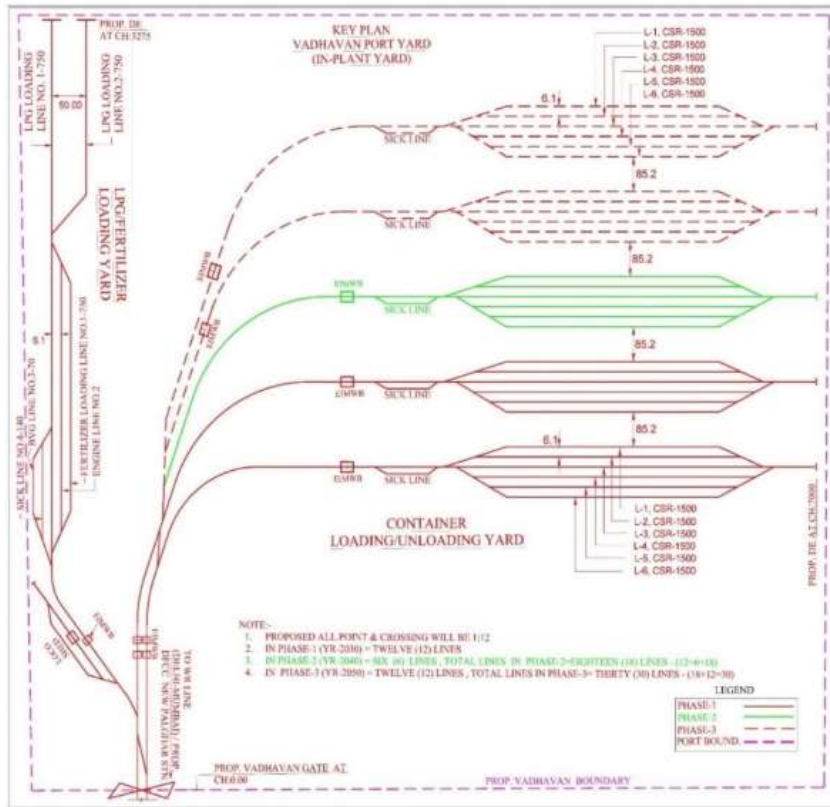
Schematic Key Plan of Vadhavan in port rail yard
